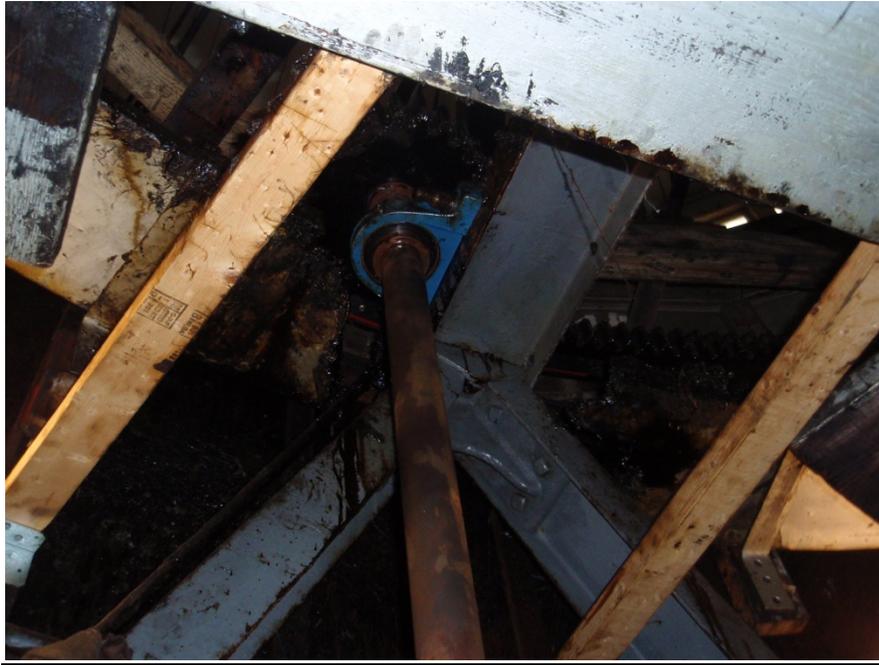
Wollman Rink. Water accumulation in electrical room.
